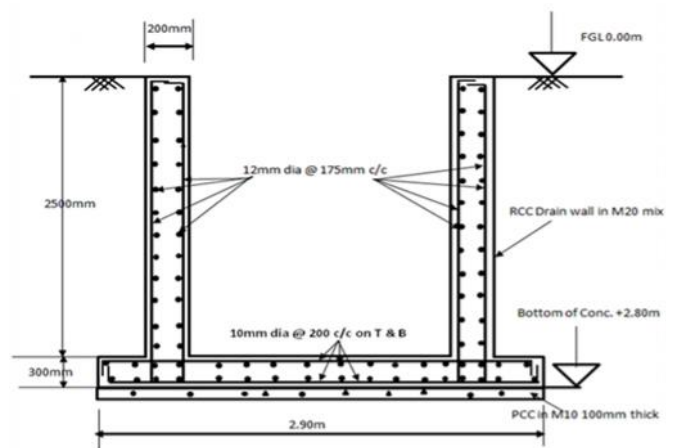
RCC drain section of size 2m (w) x 2.5m (d)
